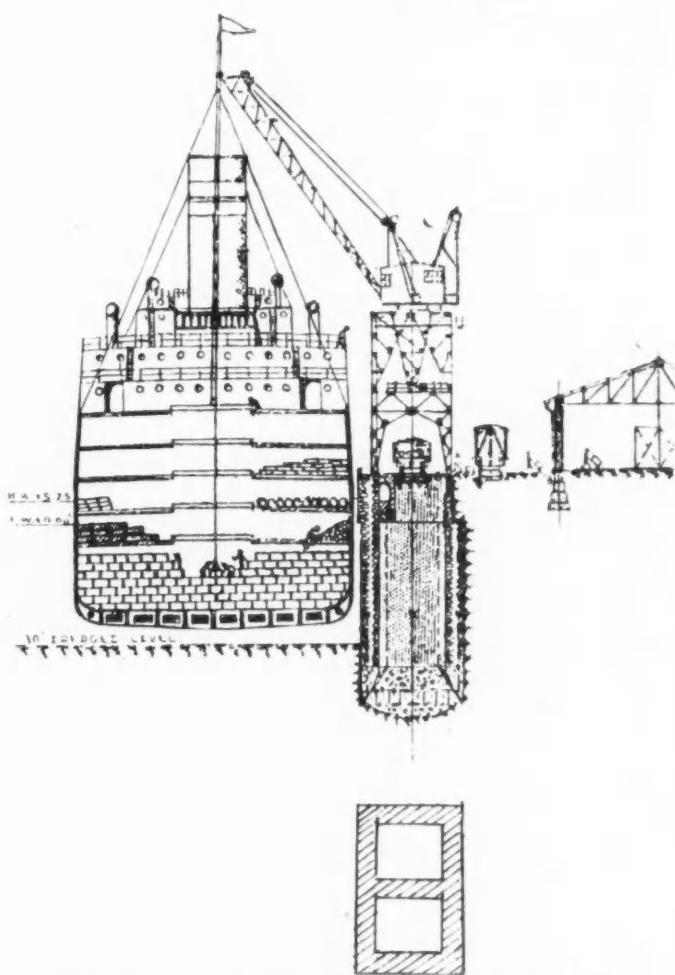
Sectional plan and elevation of monoliths forming quay wall at Vizagapatam.
